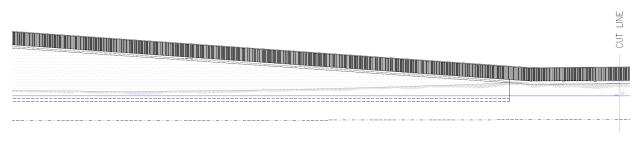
Proposed western approach to bridge over the railway line (Bridge 2) - north
